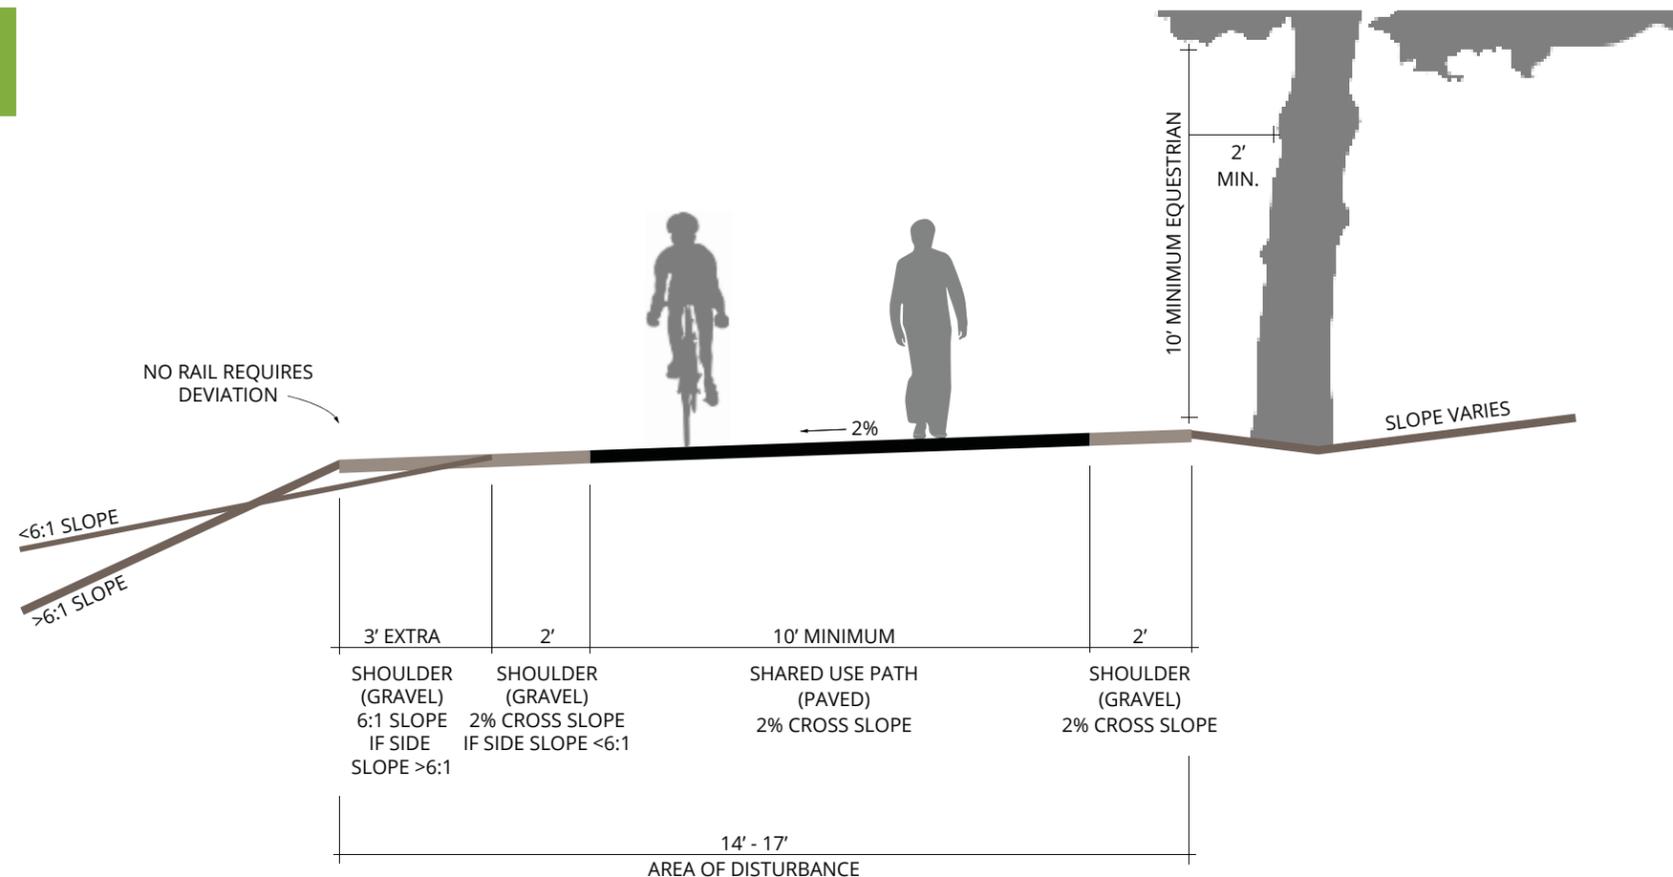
D: Typical Cross-Section on Minimal Cross-Slope
